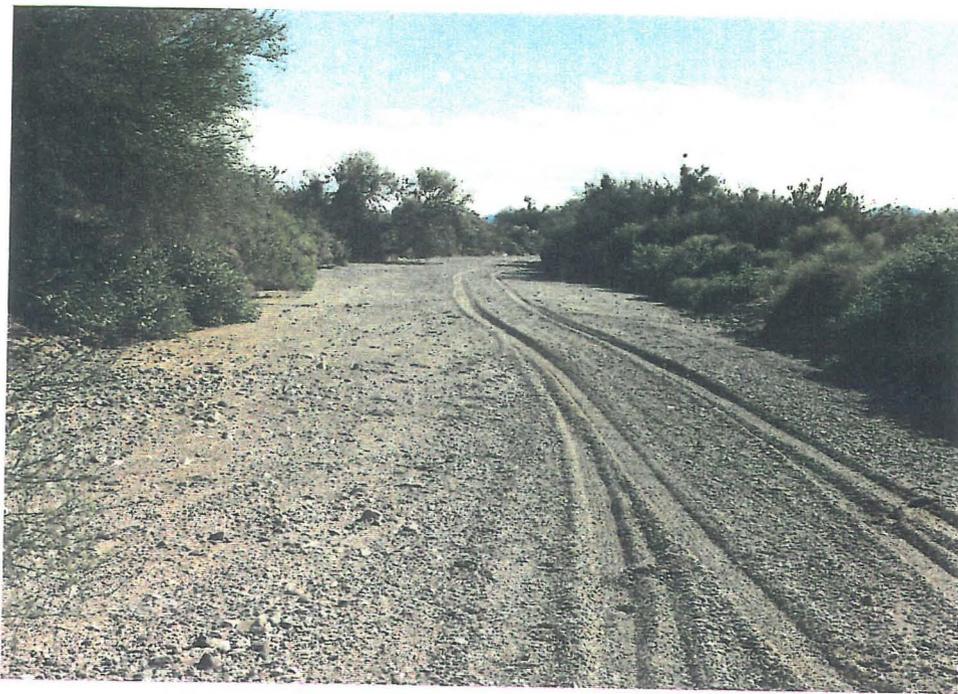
Photo taken at centerline of Patton Road crossing Trilby Wash looking south downstream.
